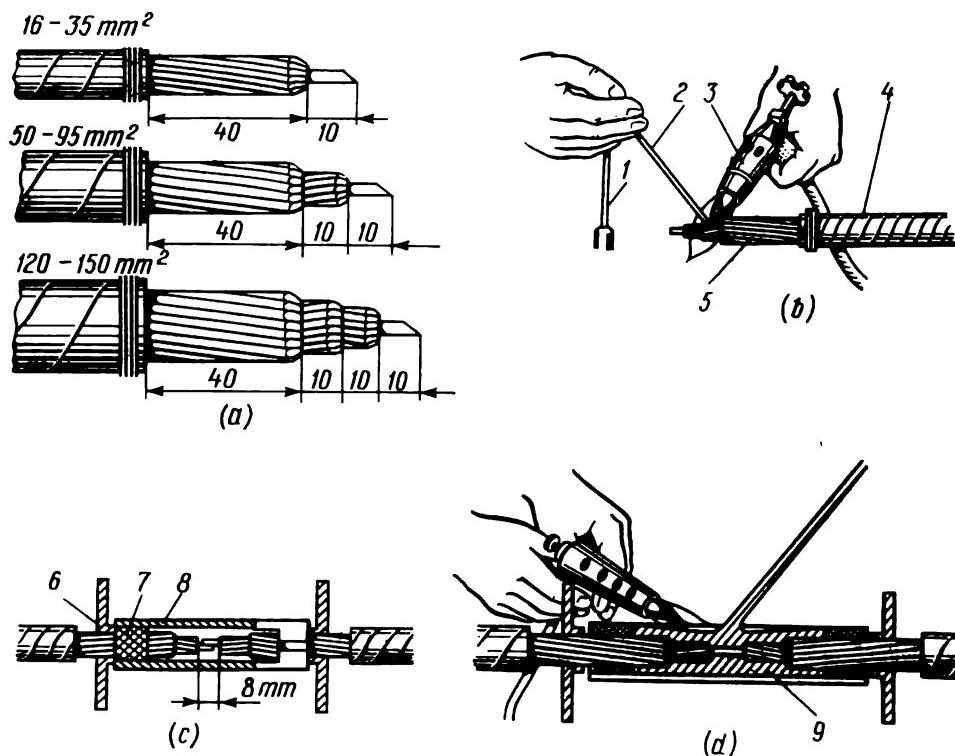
Successive stages of making off and jointing standard aluminium conductors by directly melting solder in a mould (a, b, c, d)
